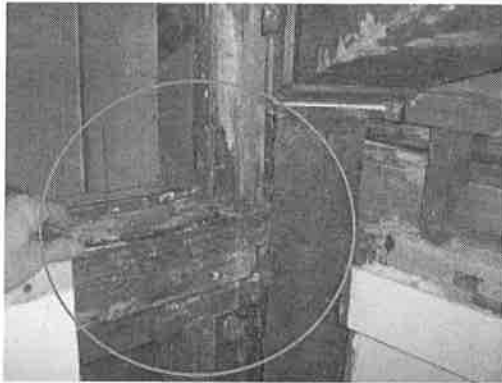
Northwest Corner Common Area Window Sill
